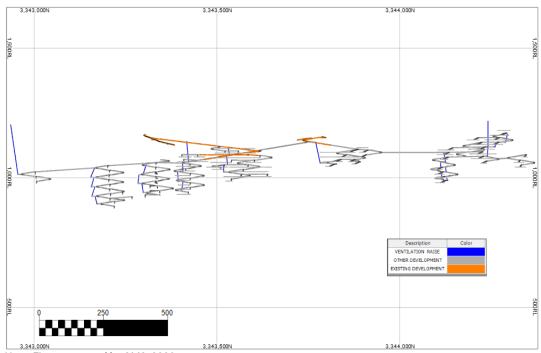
Ventilation Raise – Babicanora Sur (looking southwest)
